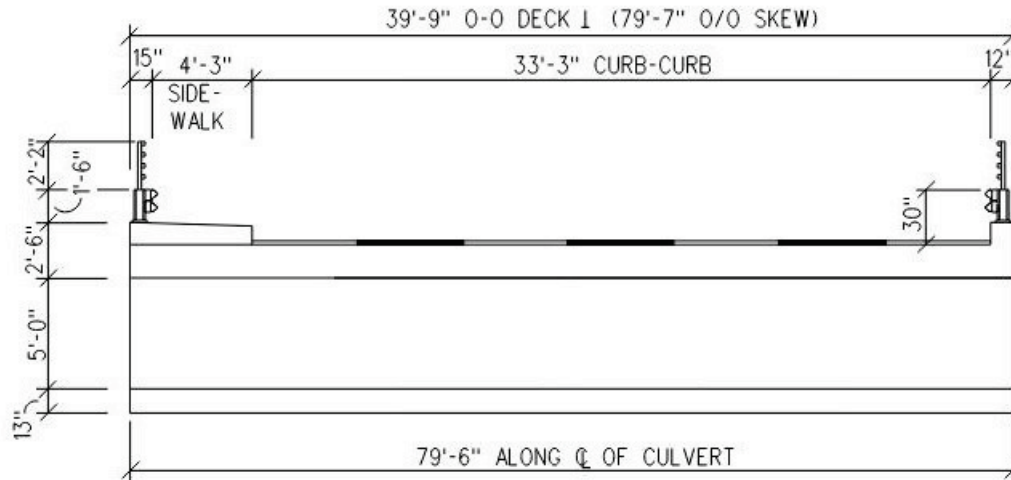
Existing typical section of County Road E 1/2 east of Bridge MESA-E.5-29.8
